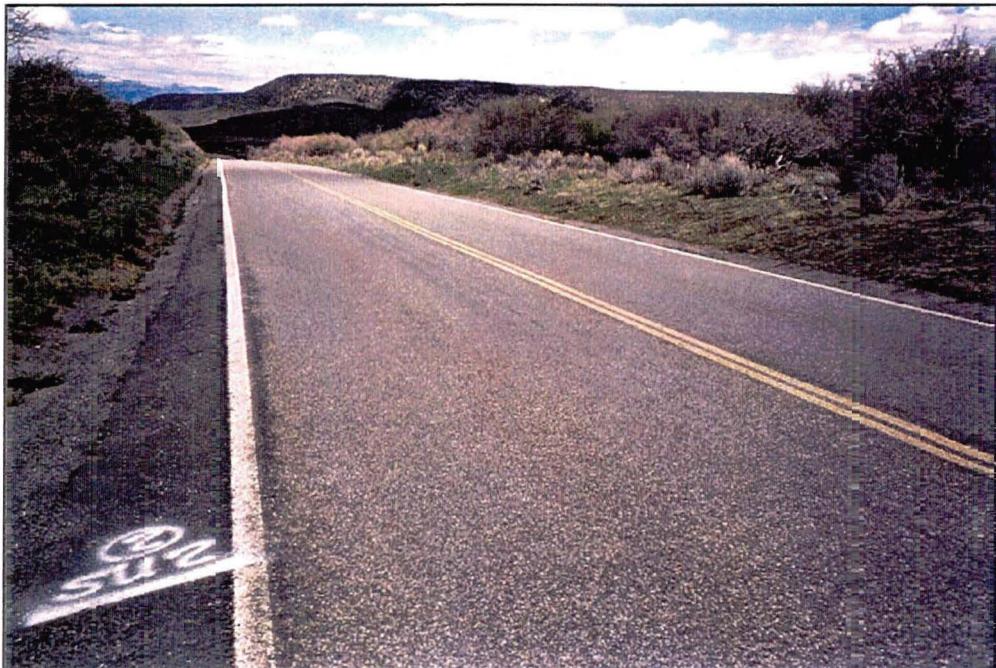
Section 2, Sample Unit 2 (MP 1.01)
